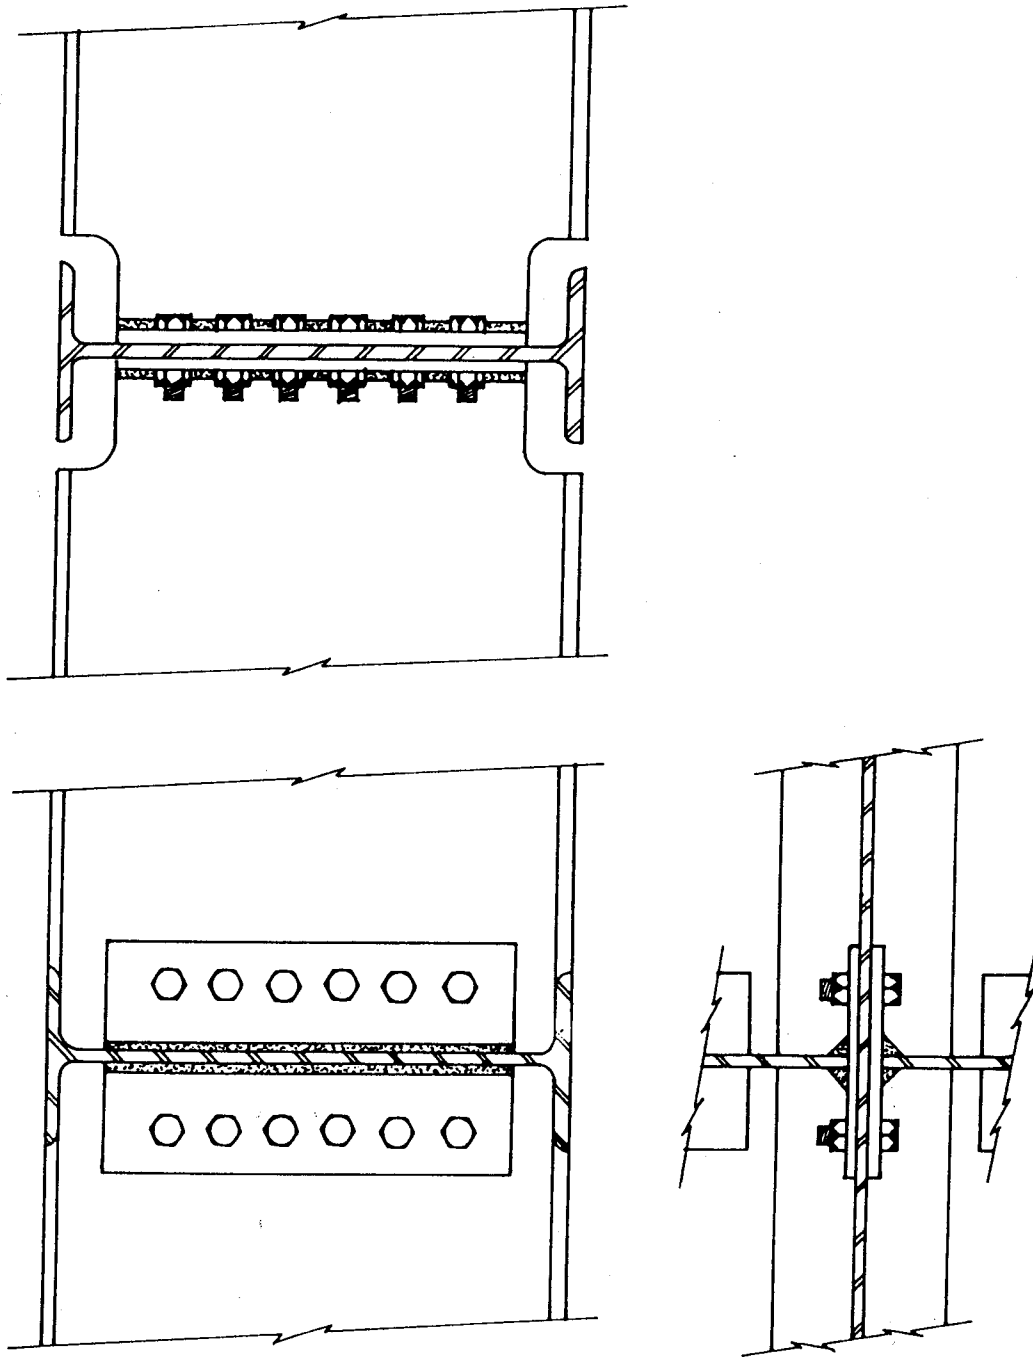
Double Flexible End Plate Connection to Beam Web Detail
